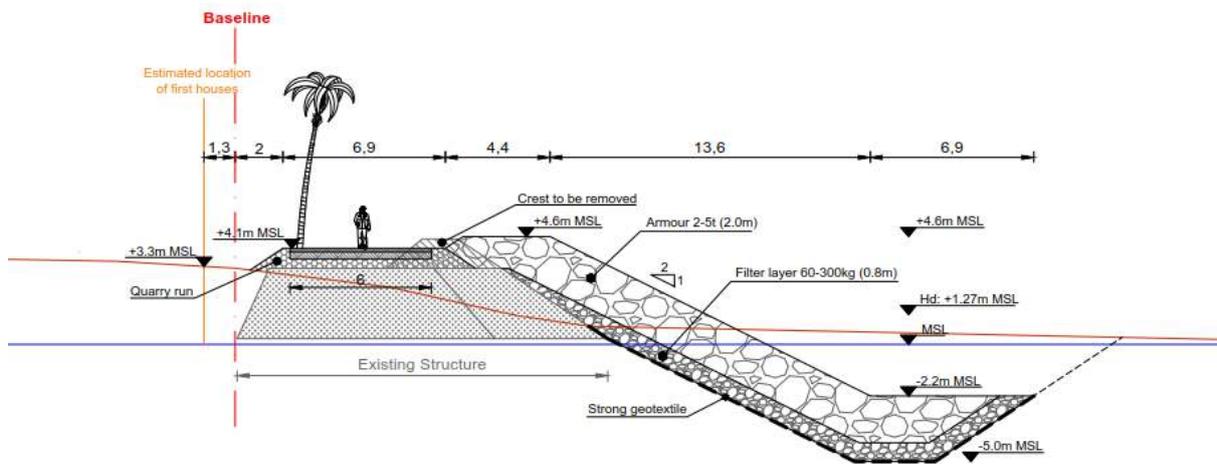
Principle cross-section Revetment New Kru Town - with existing structure – Chainage 1150
